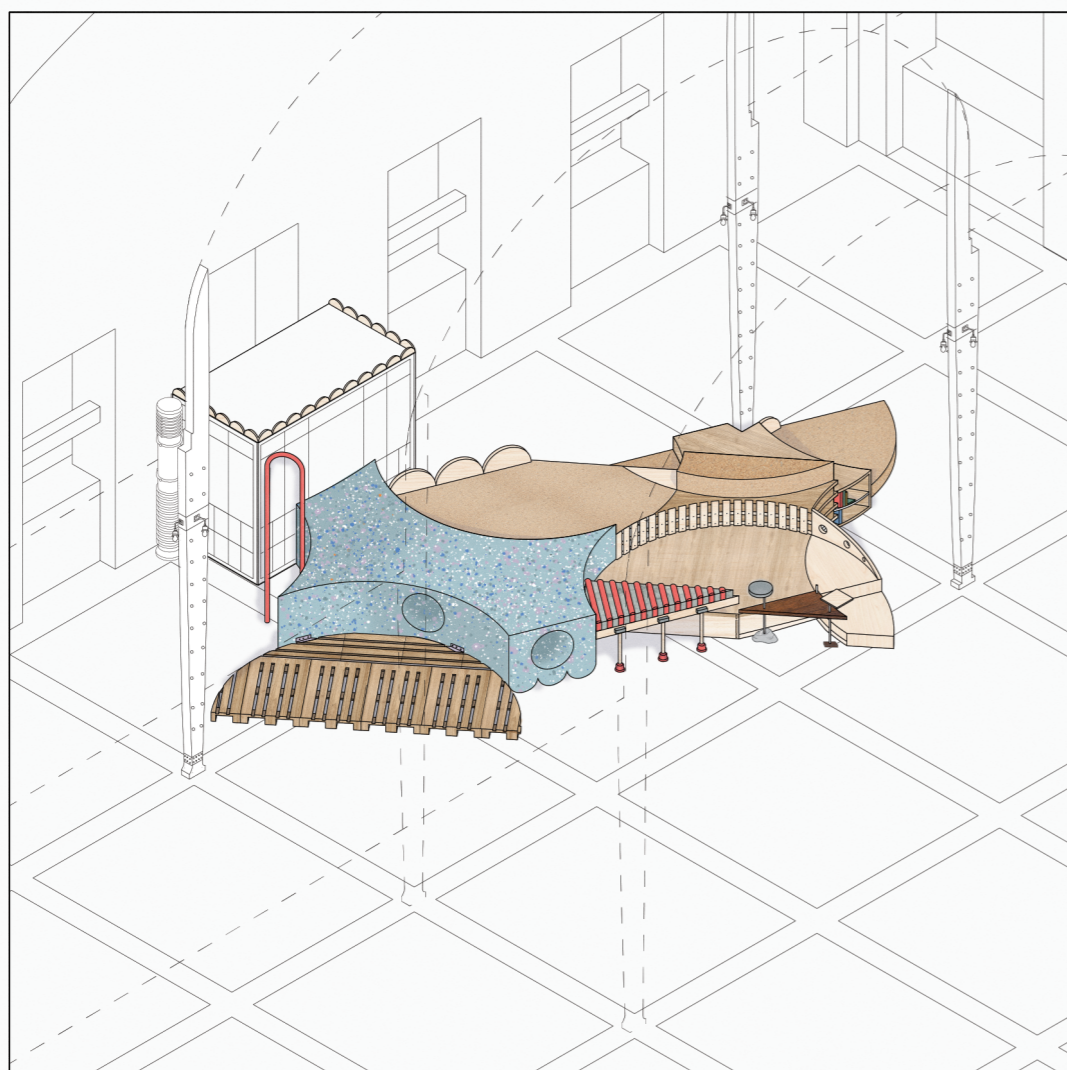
Playstage with Detail 1. Stage, play, and resting area combined. Connected to the small observation house through a play tunnel, transforming the observation landscape into a play-scape. Not Movable. Author's drawing.
